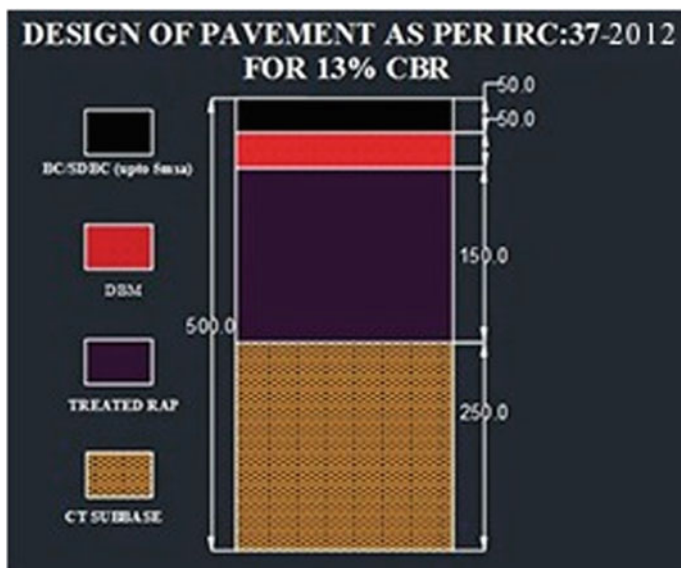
Design of pavement Cross-section 4 as per IRC:37-2012 for 13% CBR in mm
